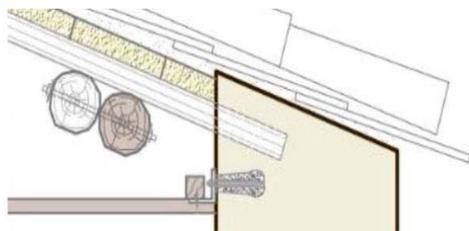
Integration of a timber roof with timpagnoli with a supporting beam and a false ceiling (Source: Caleca, 2018)
